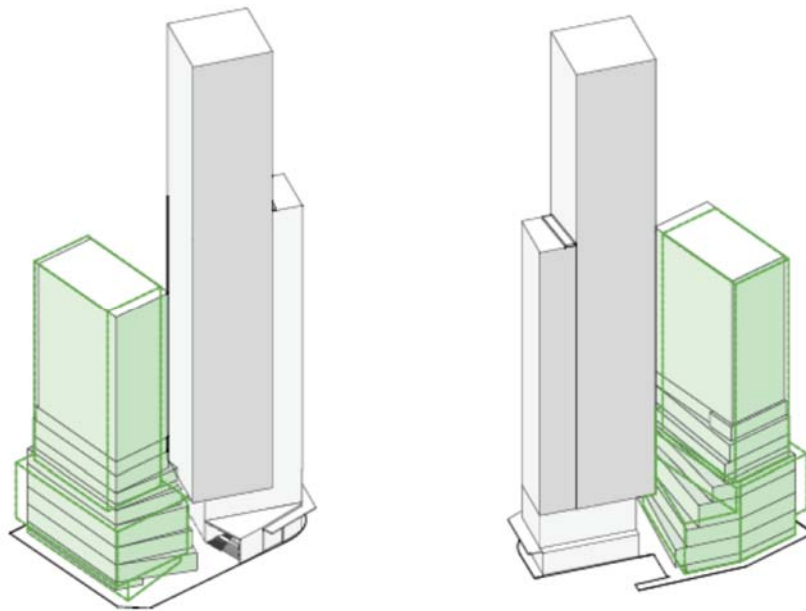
Envelope changes from a NE view (L) and SW view (R) – the green shape indicates the previously approved building form
